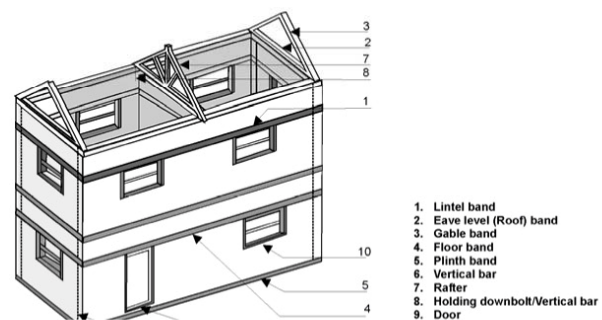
Overall arrangement of reinforcing in masonry double storey building having pitched roof (Roof not shown)
